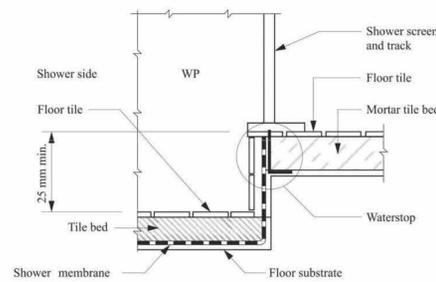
Typical enclosed stepped down shower construction (membrane above tile bed)
